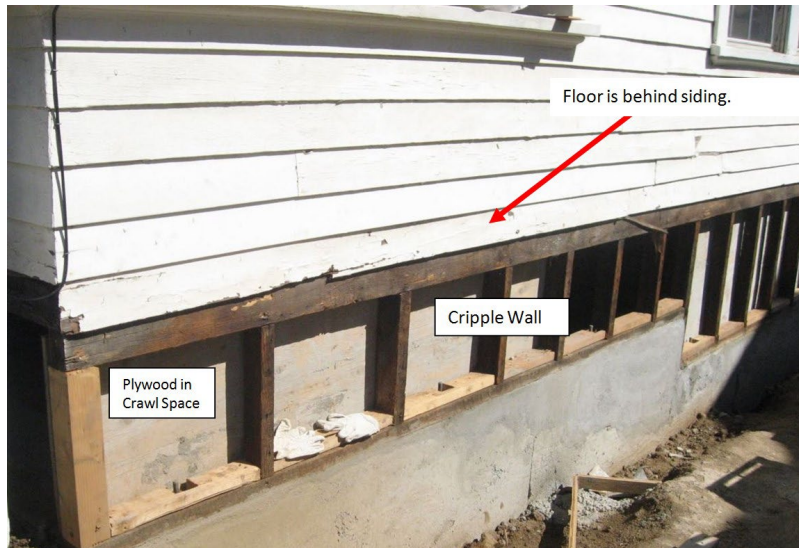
Example of a cripple wall on an old wooden house. The left end of the cripple wall has been retrofitted with plywood that resists shearing that is parallel to the wall. The solid wooden floor is strong and rigid and it ensures that there is no weak direction as long (as all the cripple walls are retrofitted).
